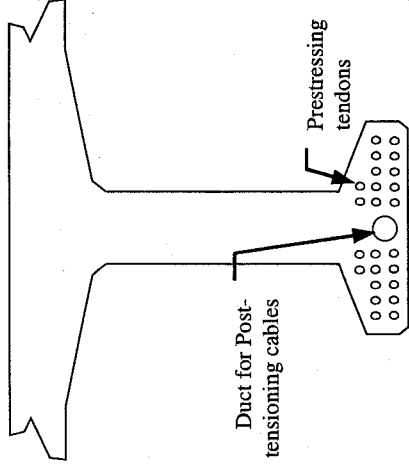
Cross sectional view of the Bulb-Tee precast sections used in the Beddington Bridge; Bragg grating sensors were applied on the surface of the prestressing tendons
